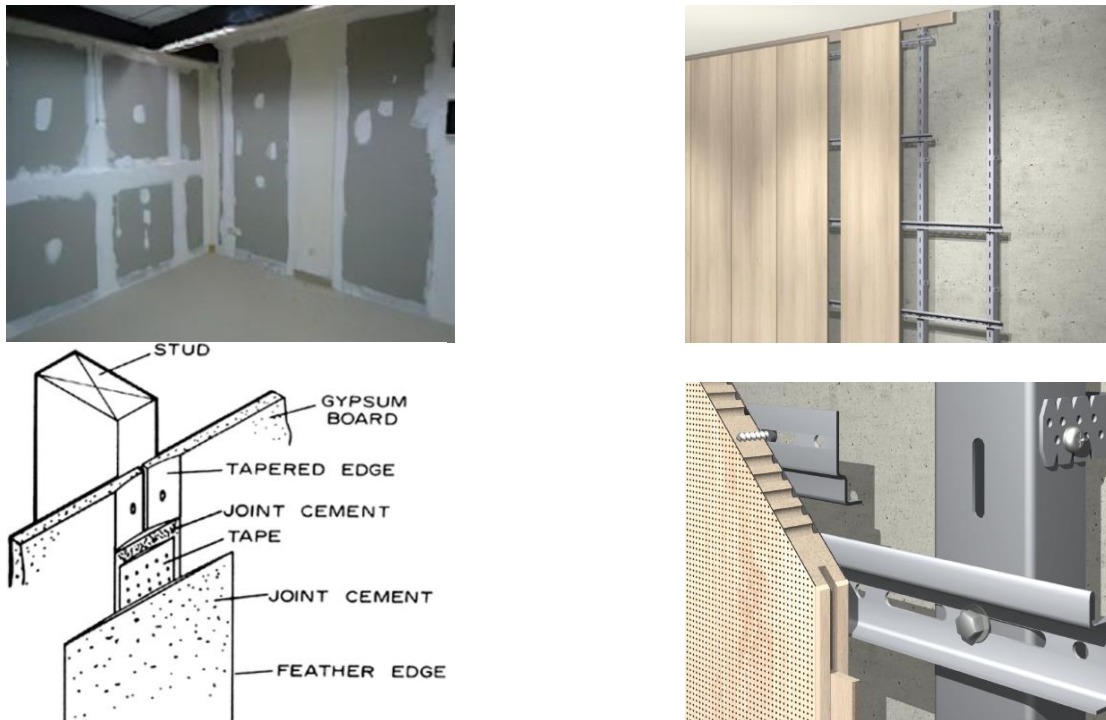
Left: Low-level reversibility wood framed gypsum board (Adapted from Civilguidelines.com images), and Right: high-level reversibility prefabricated panelized wall finish (Adapted from Ambienta Architectural Systems images)
